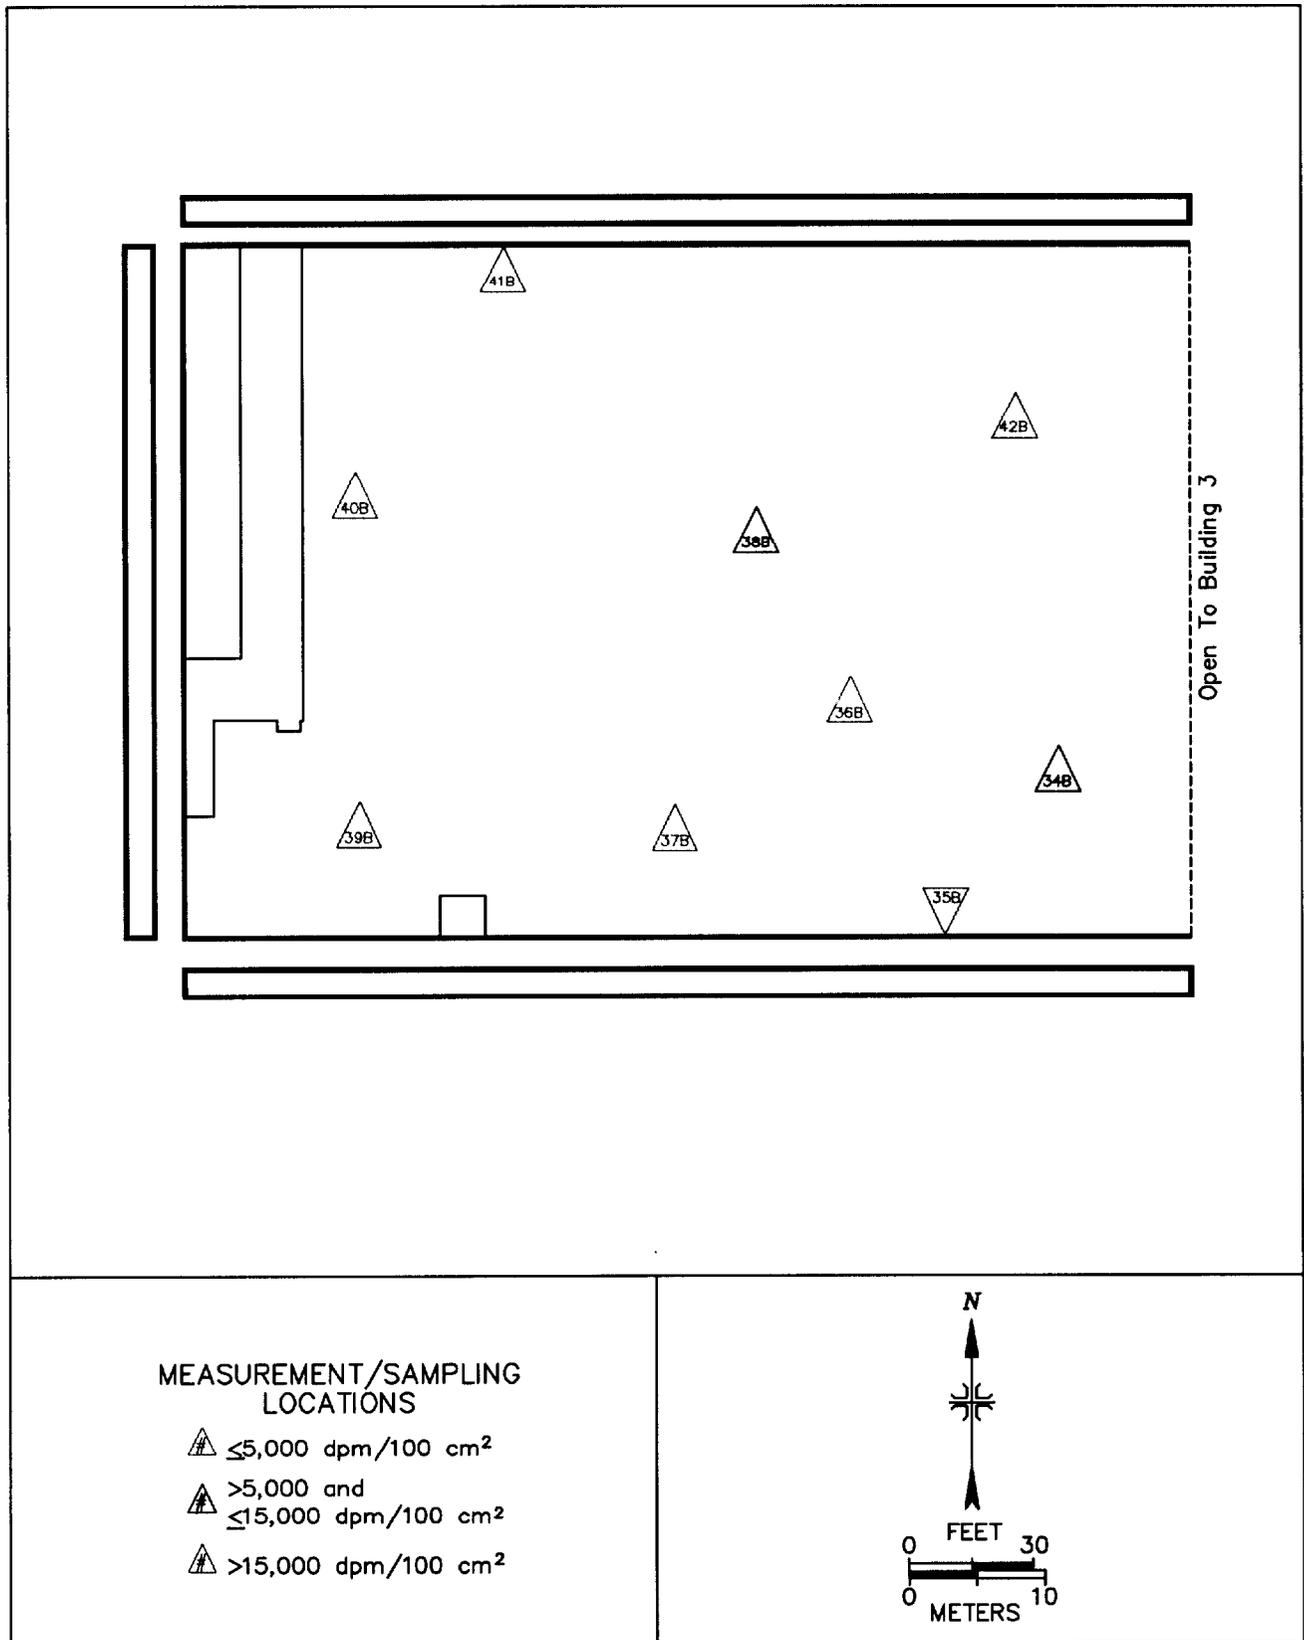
Building 4 and 9, Upper Surfaces – Direct Measurement and Sampling Locations
